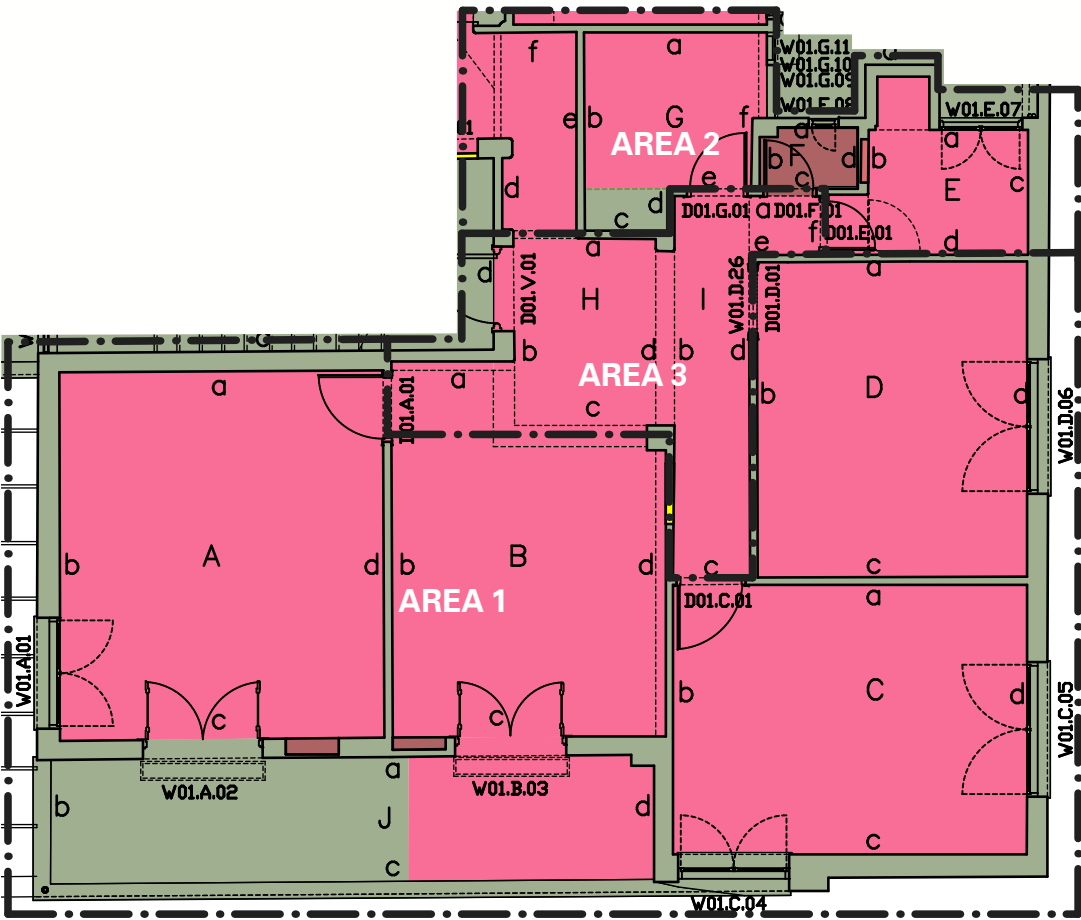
2nd floor, apartment 1, preservation measures, walls and floors
